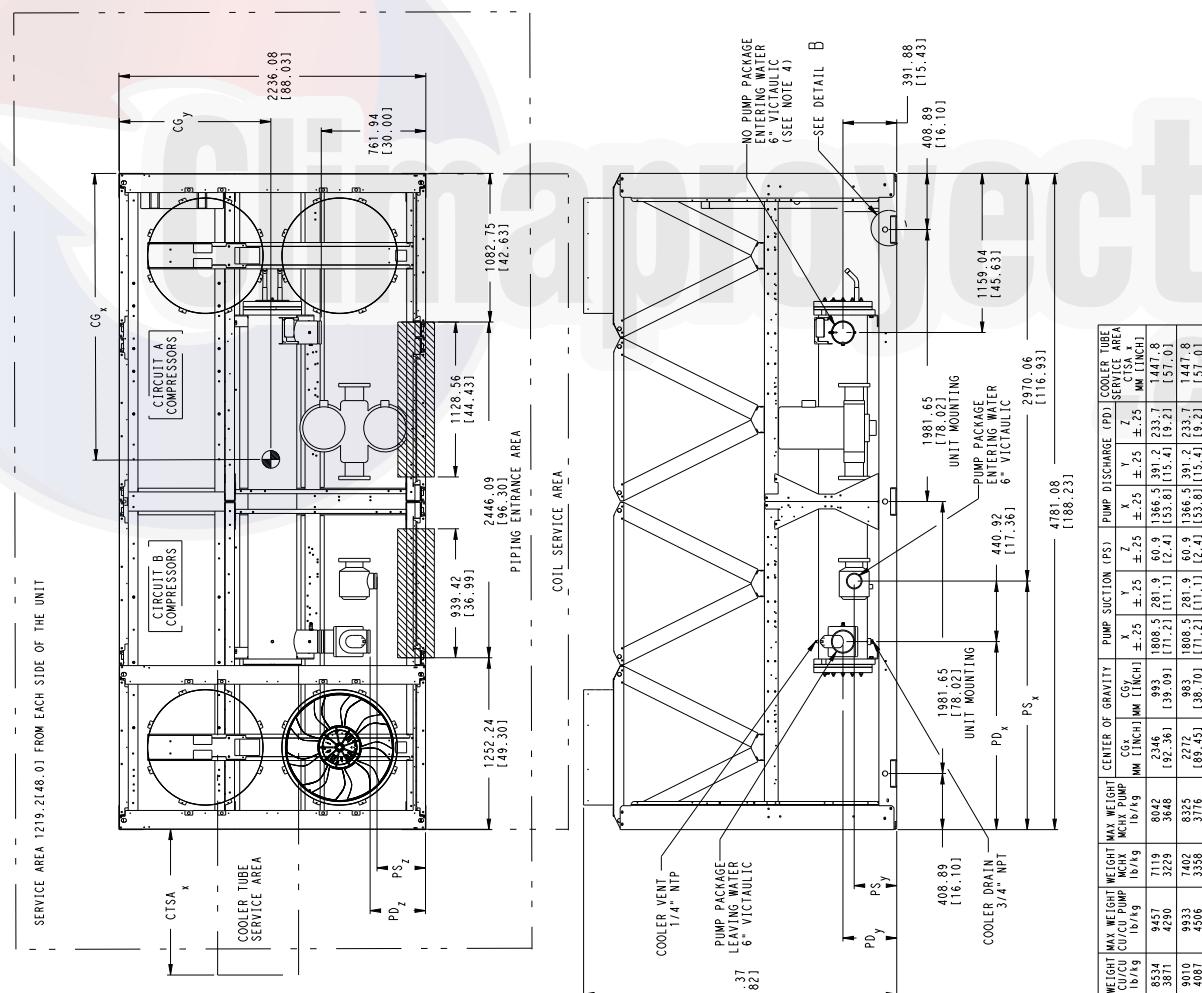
30RB120, 130 Air-Cooled Chiller Dimensions
